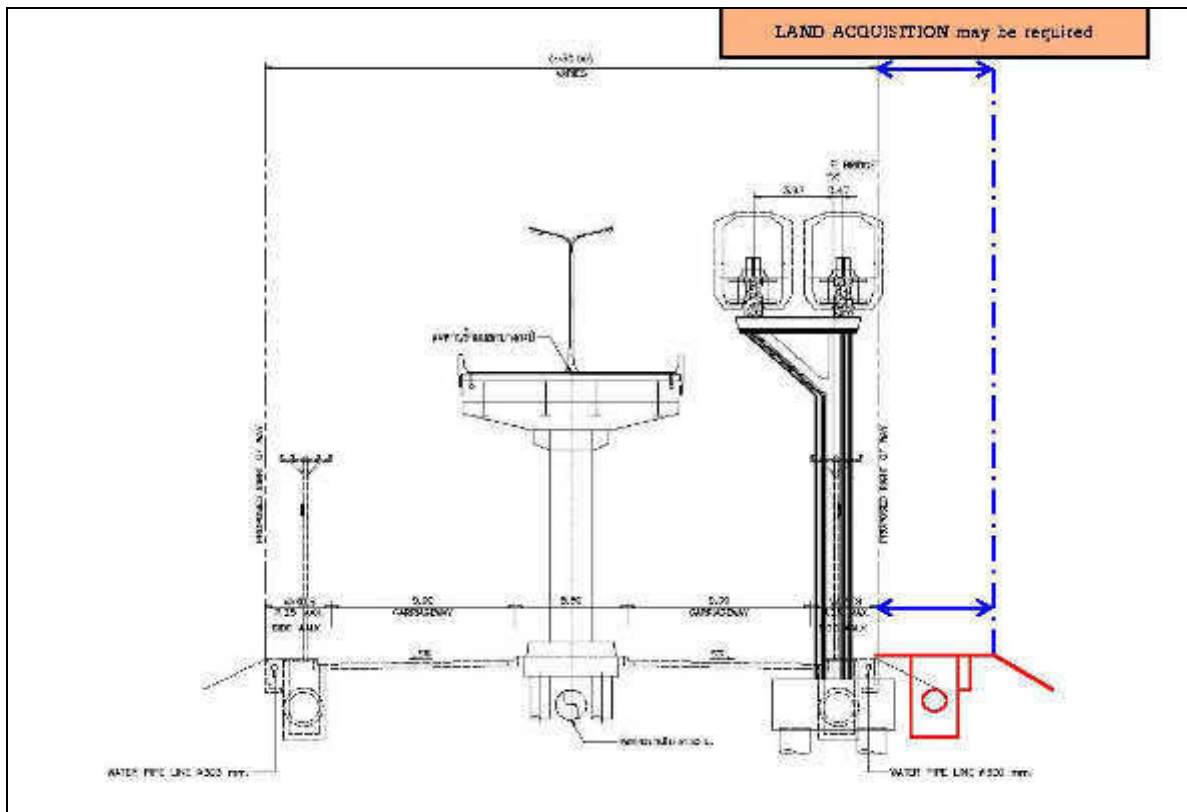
1 Cross section of project at Bang Kapi Junction, 1<sup>st</sup> Alternative
